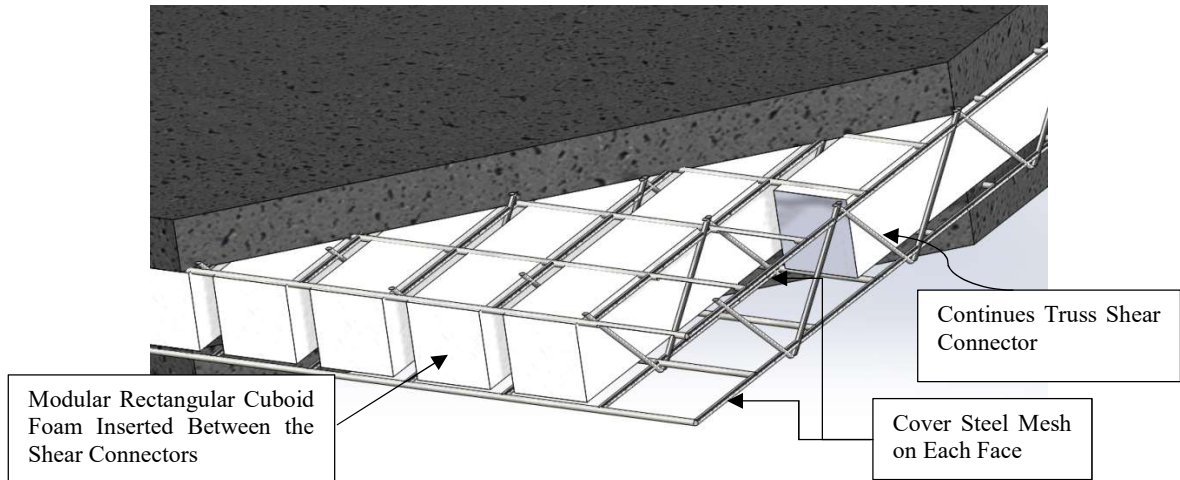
Typical CSP Cross Section with Continues Shear Truss Connectors
